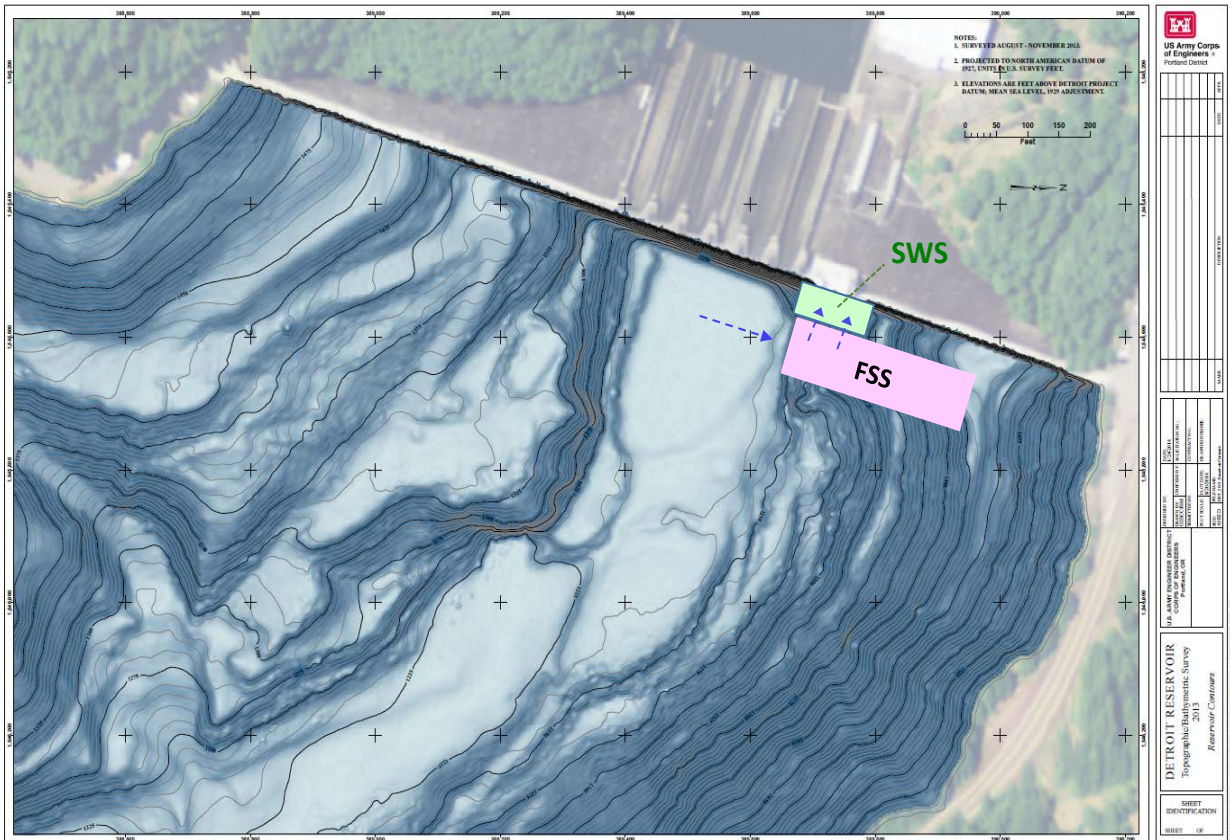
Conceptual Plan View of FSS with At-Dam SWS at Detroit Dam
